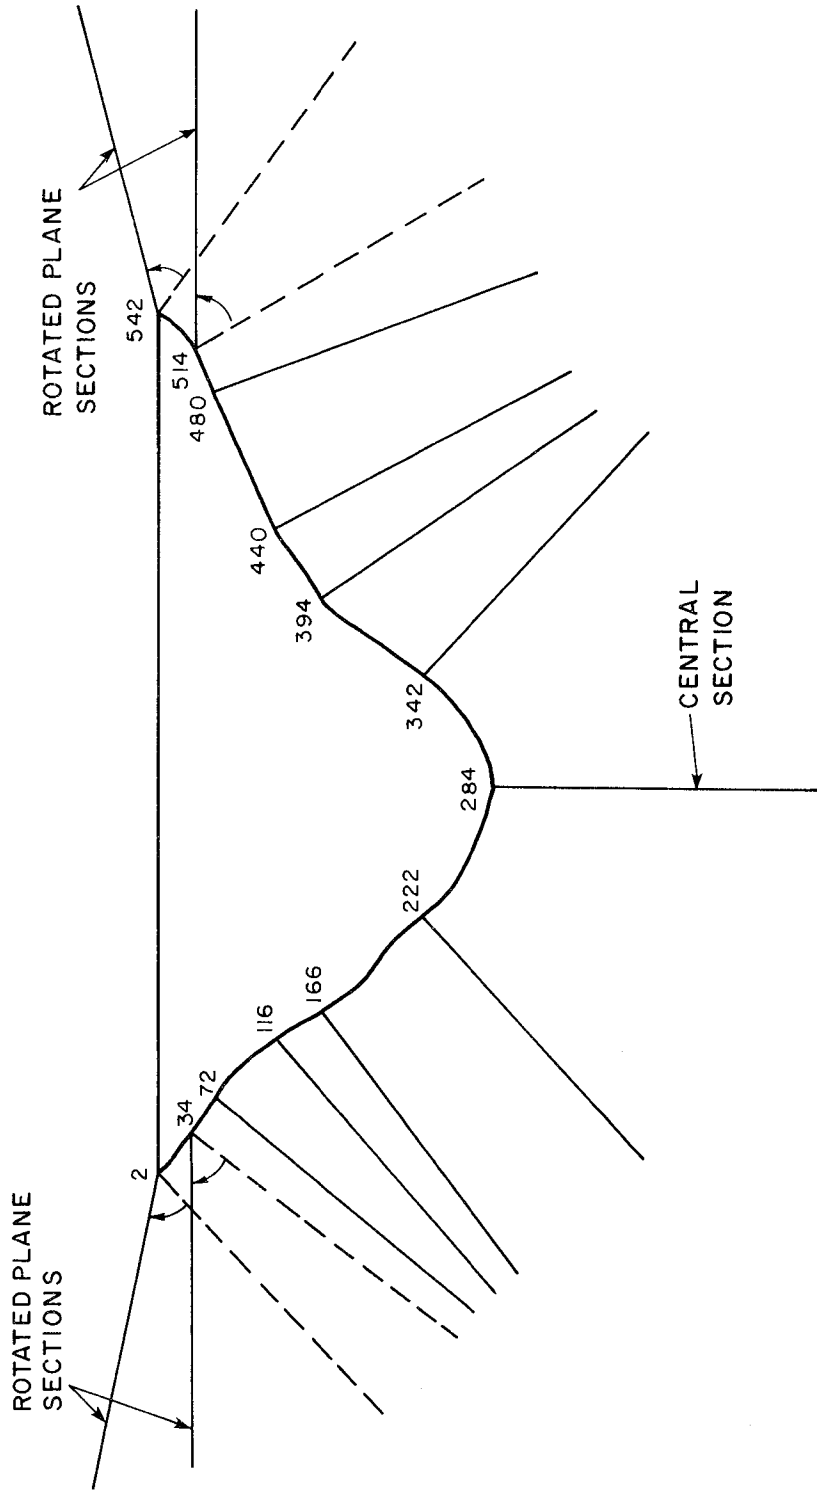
VIEW FROM DOWNSTREAM OF FINITE ELEMENT PLANES IN FOUNDATION
